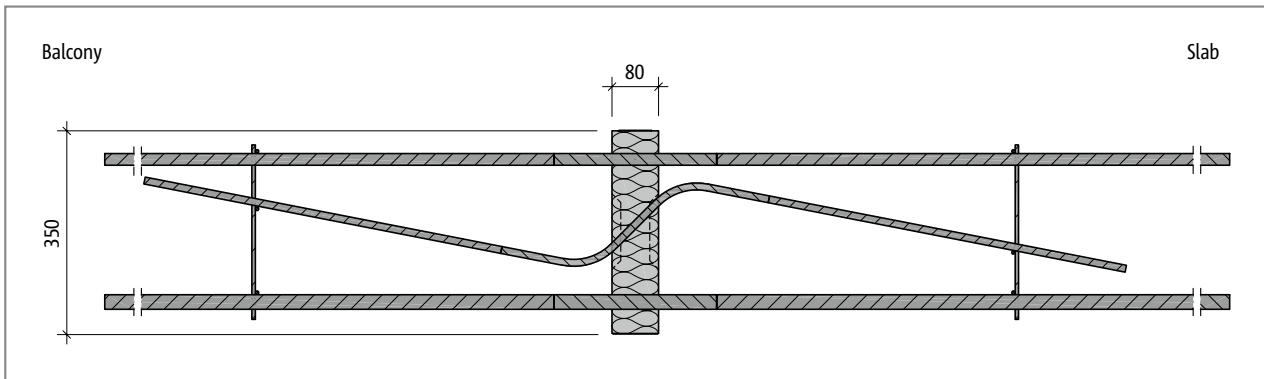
Schöck Isokorb® T type B-M1-V1 for R0: Product section
